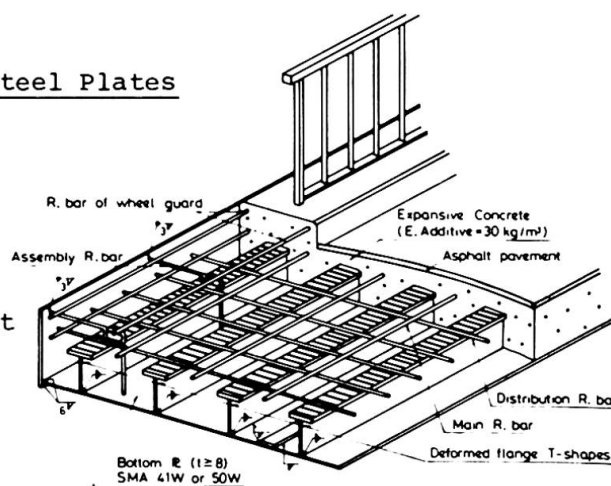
Schema of composite slab bridges using deformed flange T-shapes
